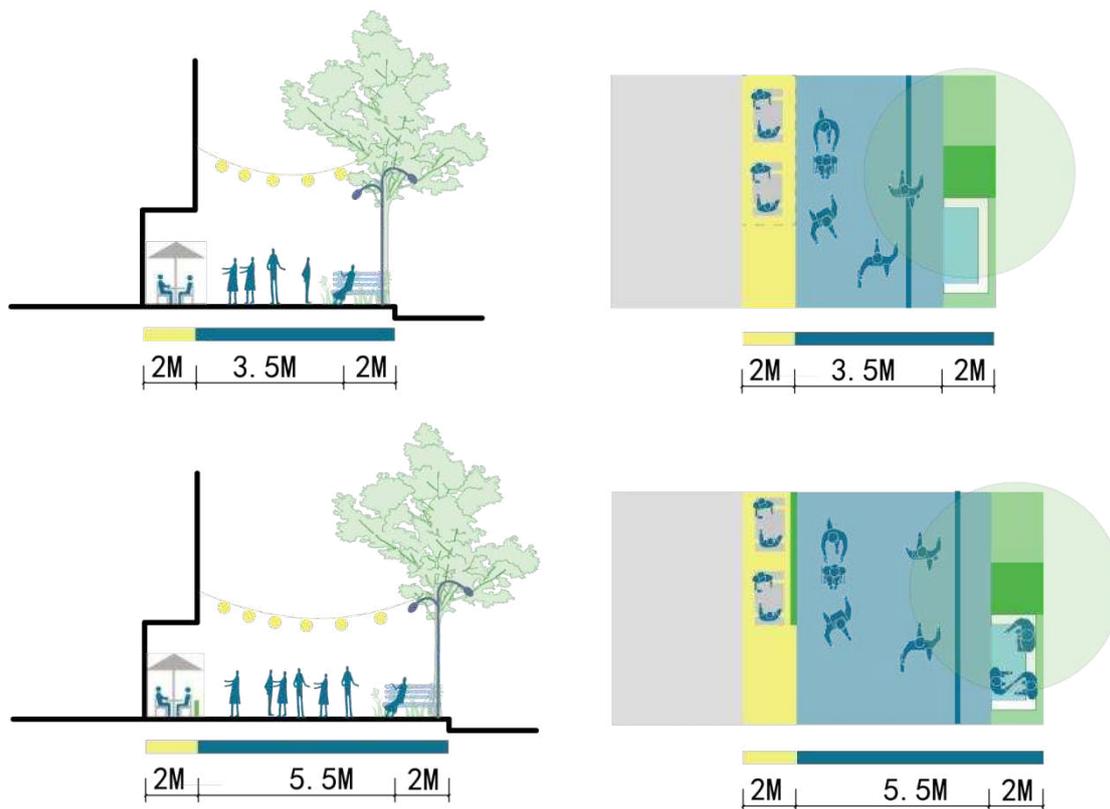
Pavement at Tianhe Nanyi Road (Source: Completed by author)
